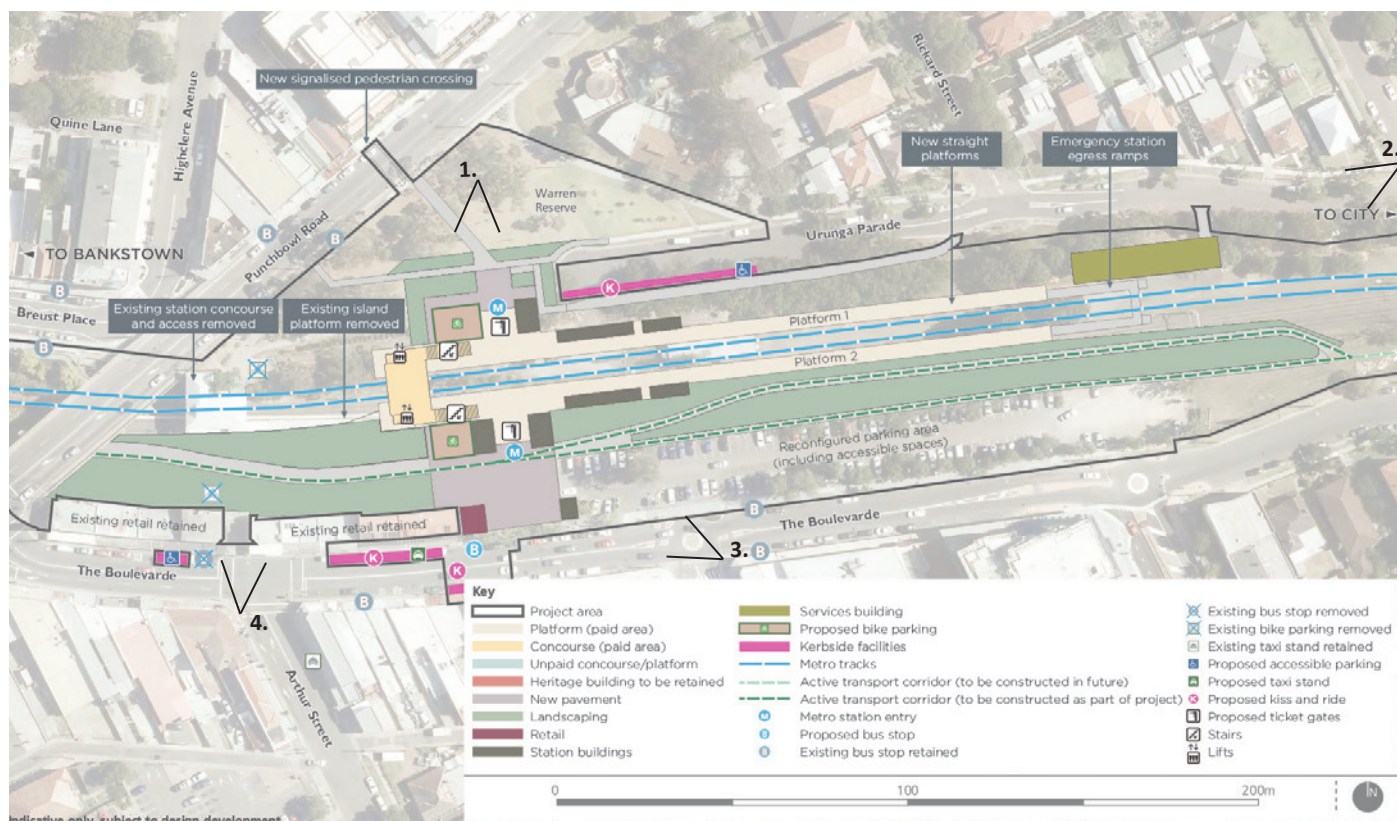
VIEWPOINT LOCATION PLAN
